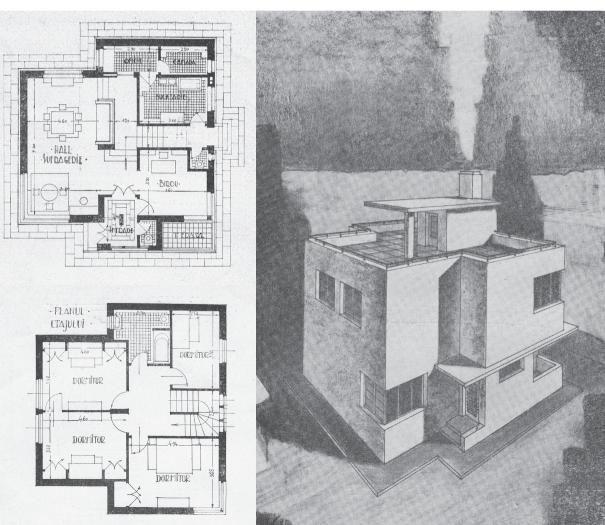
"Seaside Villa " [a - perspective, b - floor plan]. Author: arch. Ştefan Peterneli Fig. 2. "Mar-Kisa Villa" [a - perspective, b - ground floor plan, c - first floor plan]. Author: L. P.
